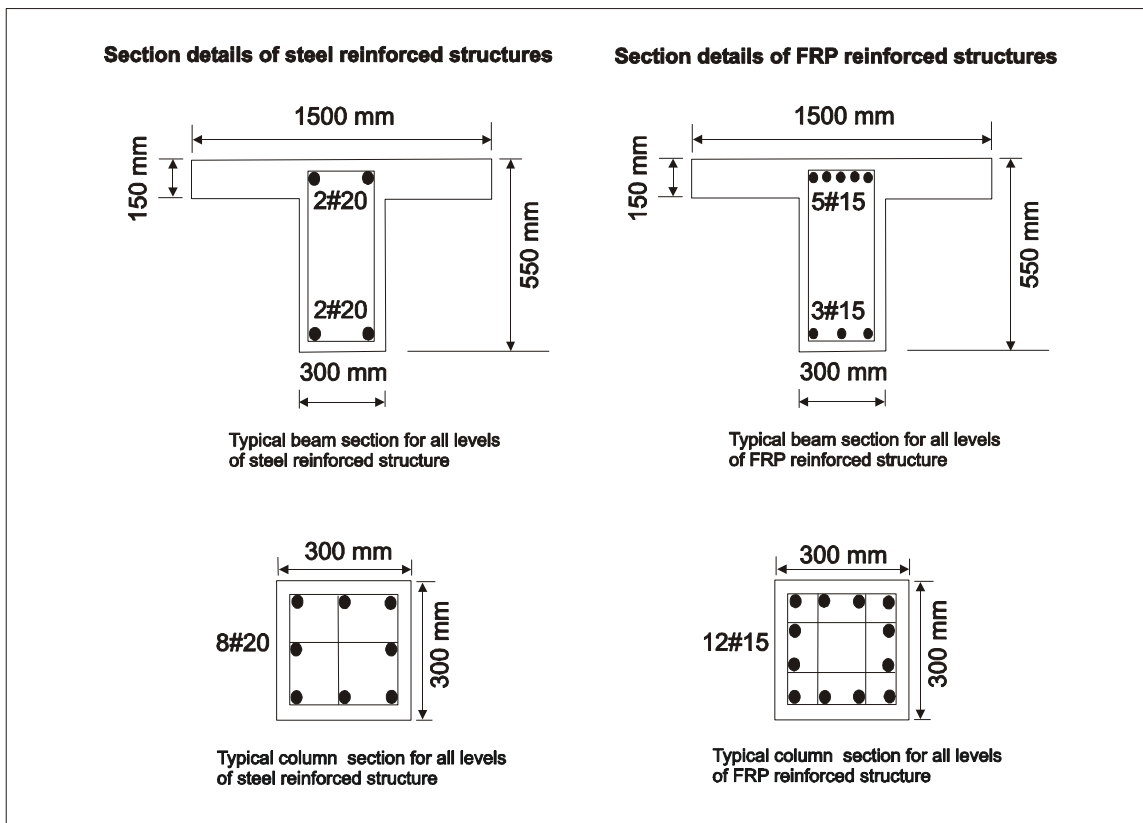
Design details of frame elements for steel and FRP reinforced structures.
